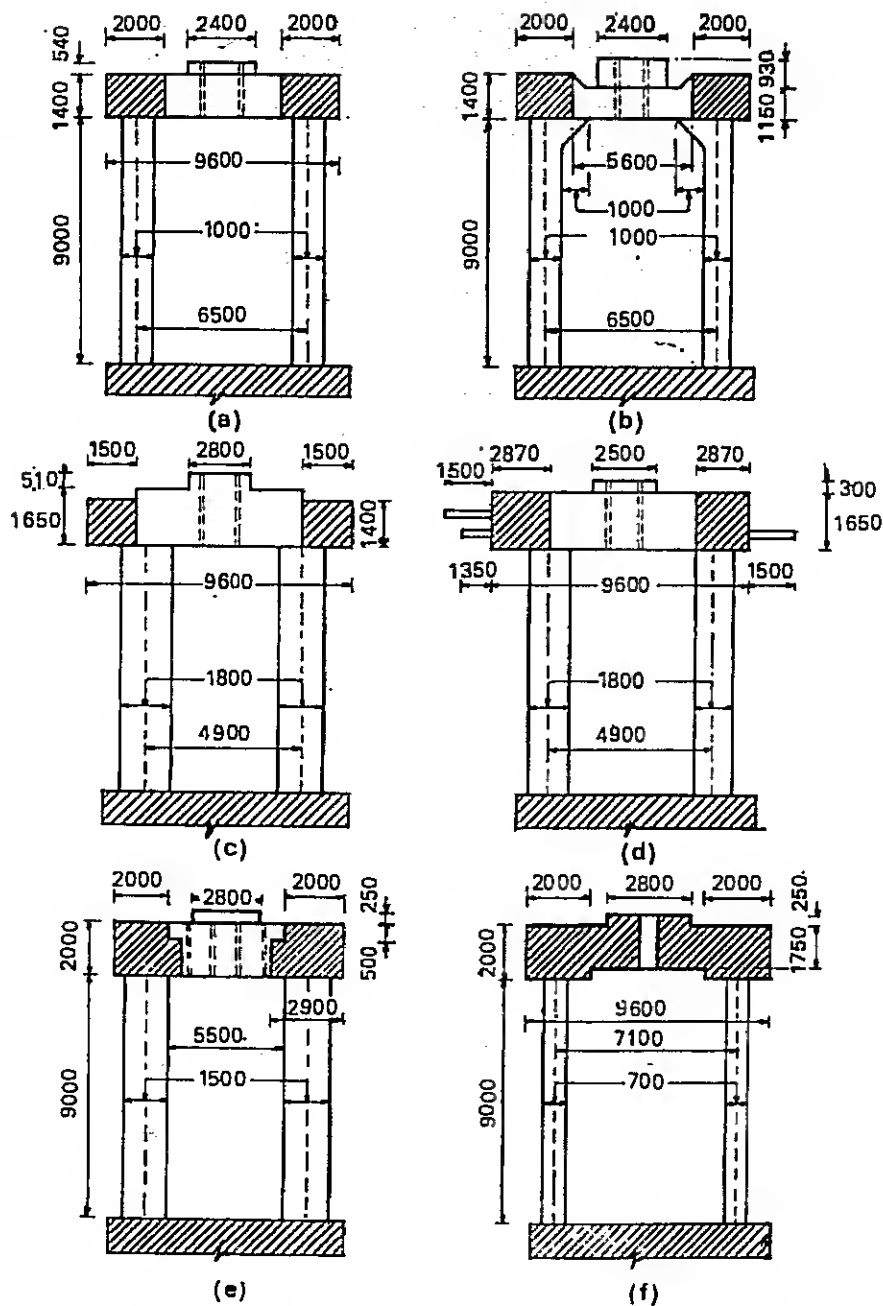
Typical Cross-Sections—(a) Section at P-P, (b) Section at Q-Q, (c) Section at R-R, (d) Section at S-S, (e) Section at X-X, and (f) Section at Y-Y.
